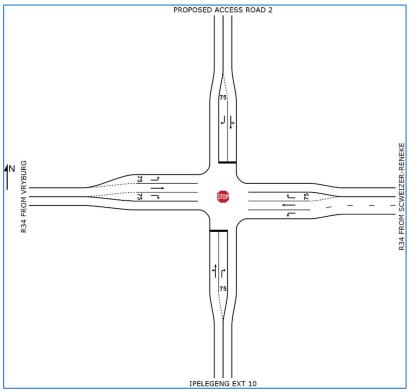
Proposed Layout of R34 and Proposed Access Road 2 – Ferreira Avenue
